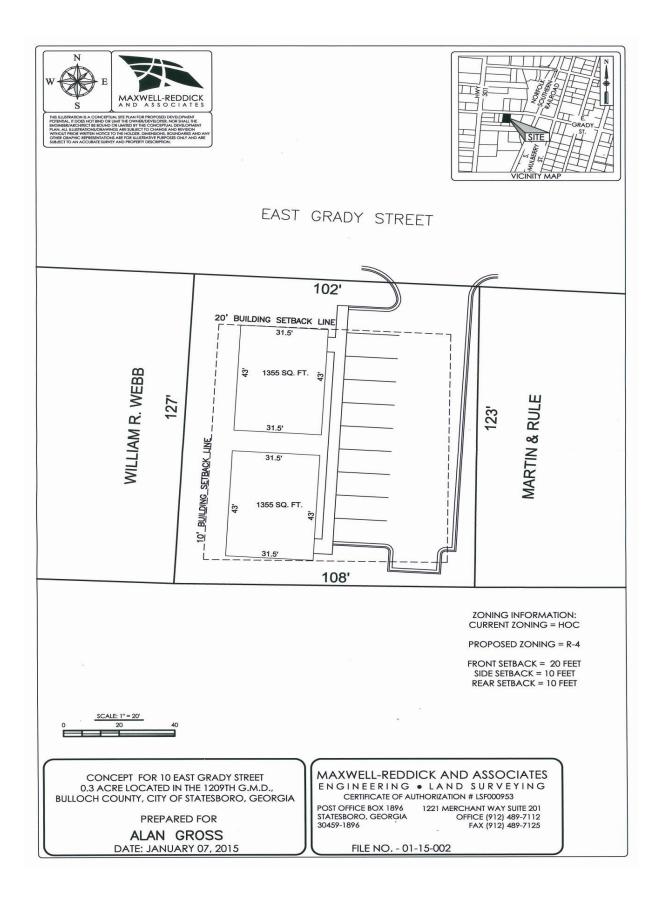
EXHIBIT B: PROPOSED SITE & CONCEPT PLANS
